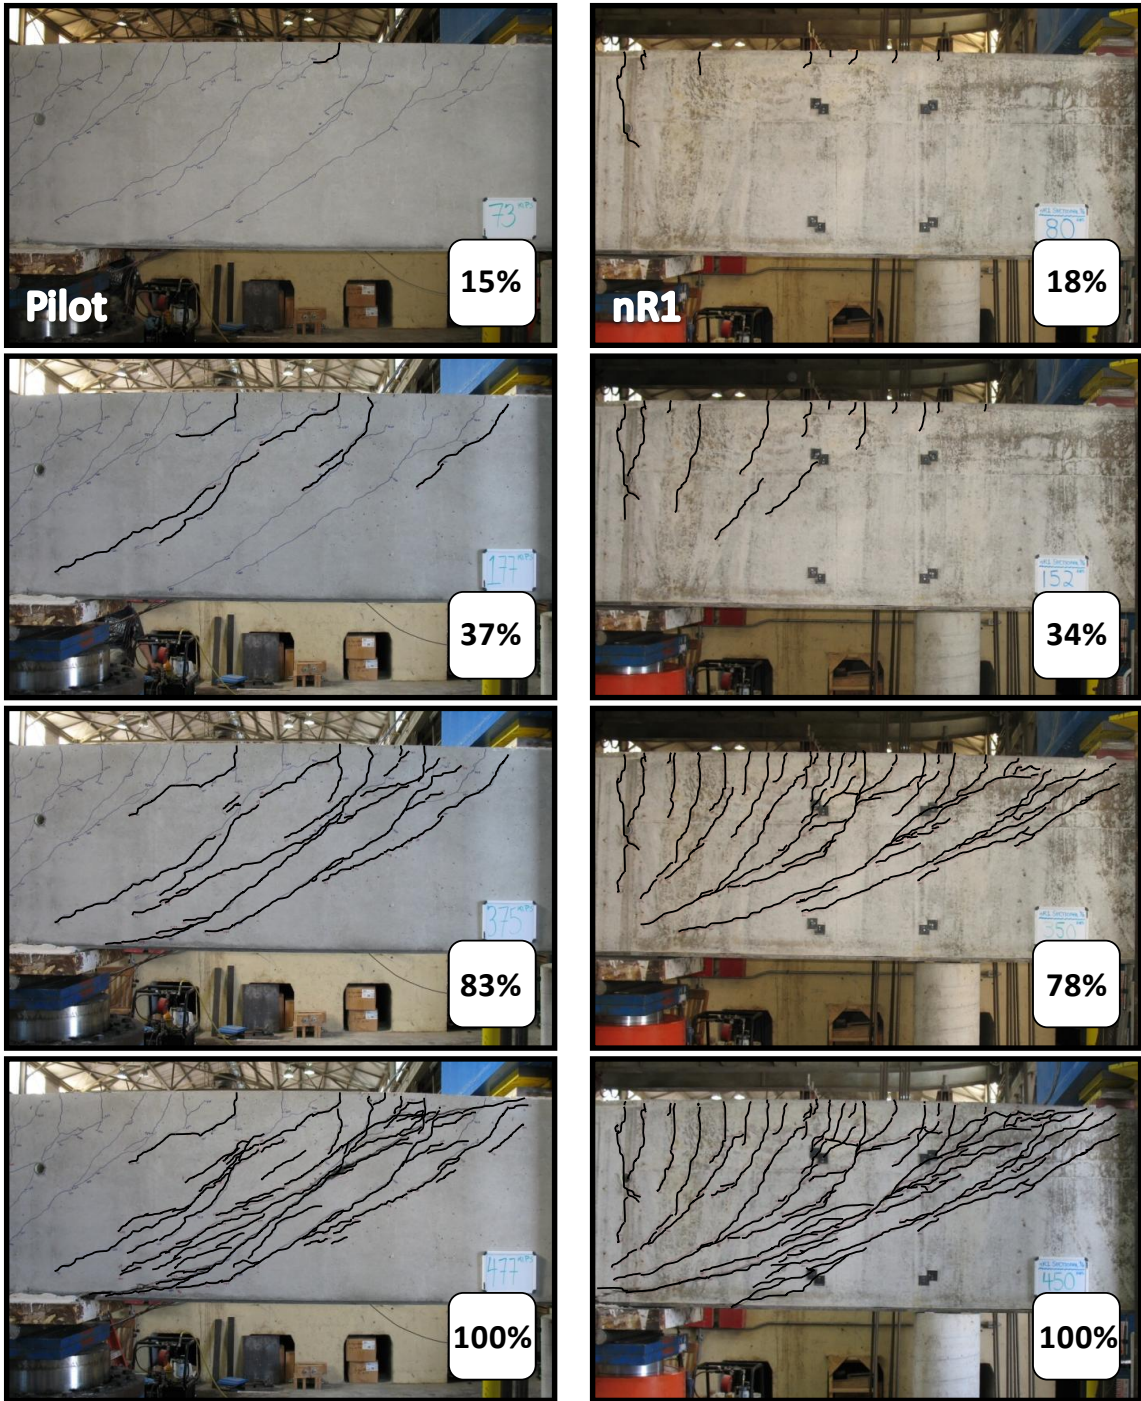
Sectional Shear Tests within Non-Reactive Specimens
